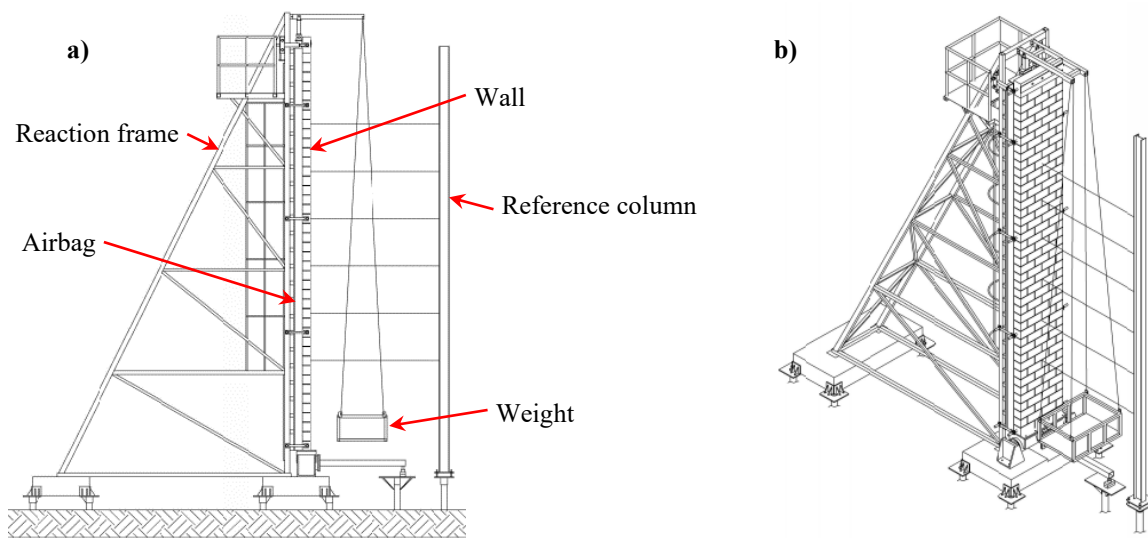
3D Test setup for testing slender masonry walls (a) Lateral view (b) Isometric.
